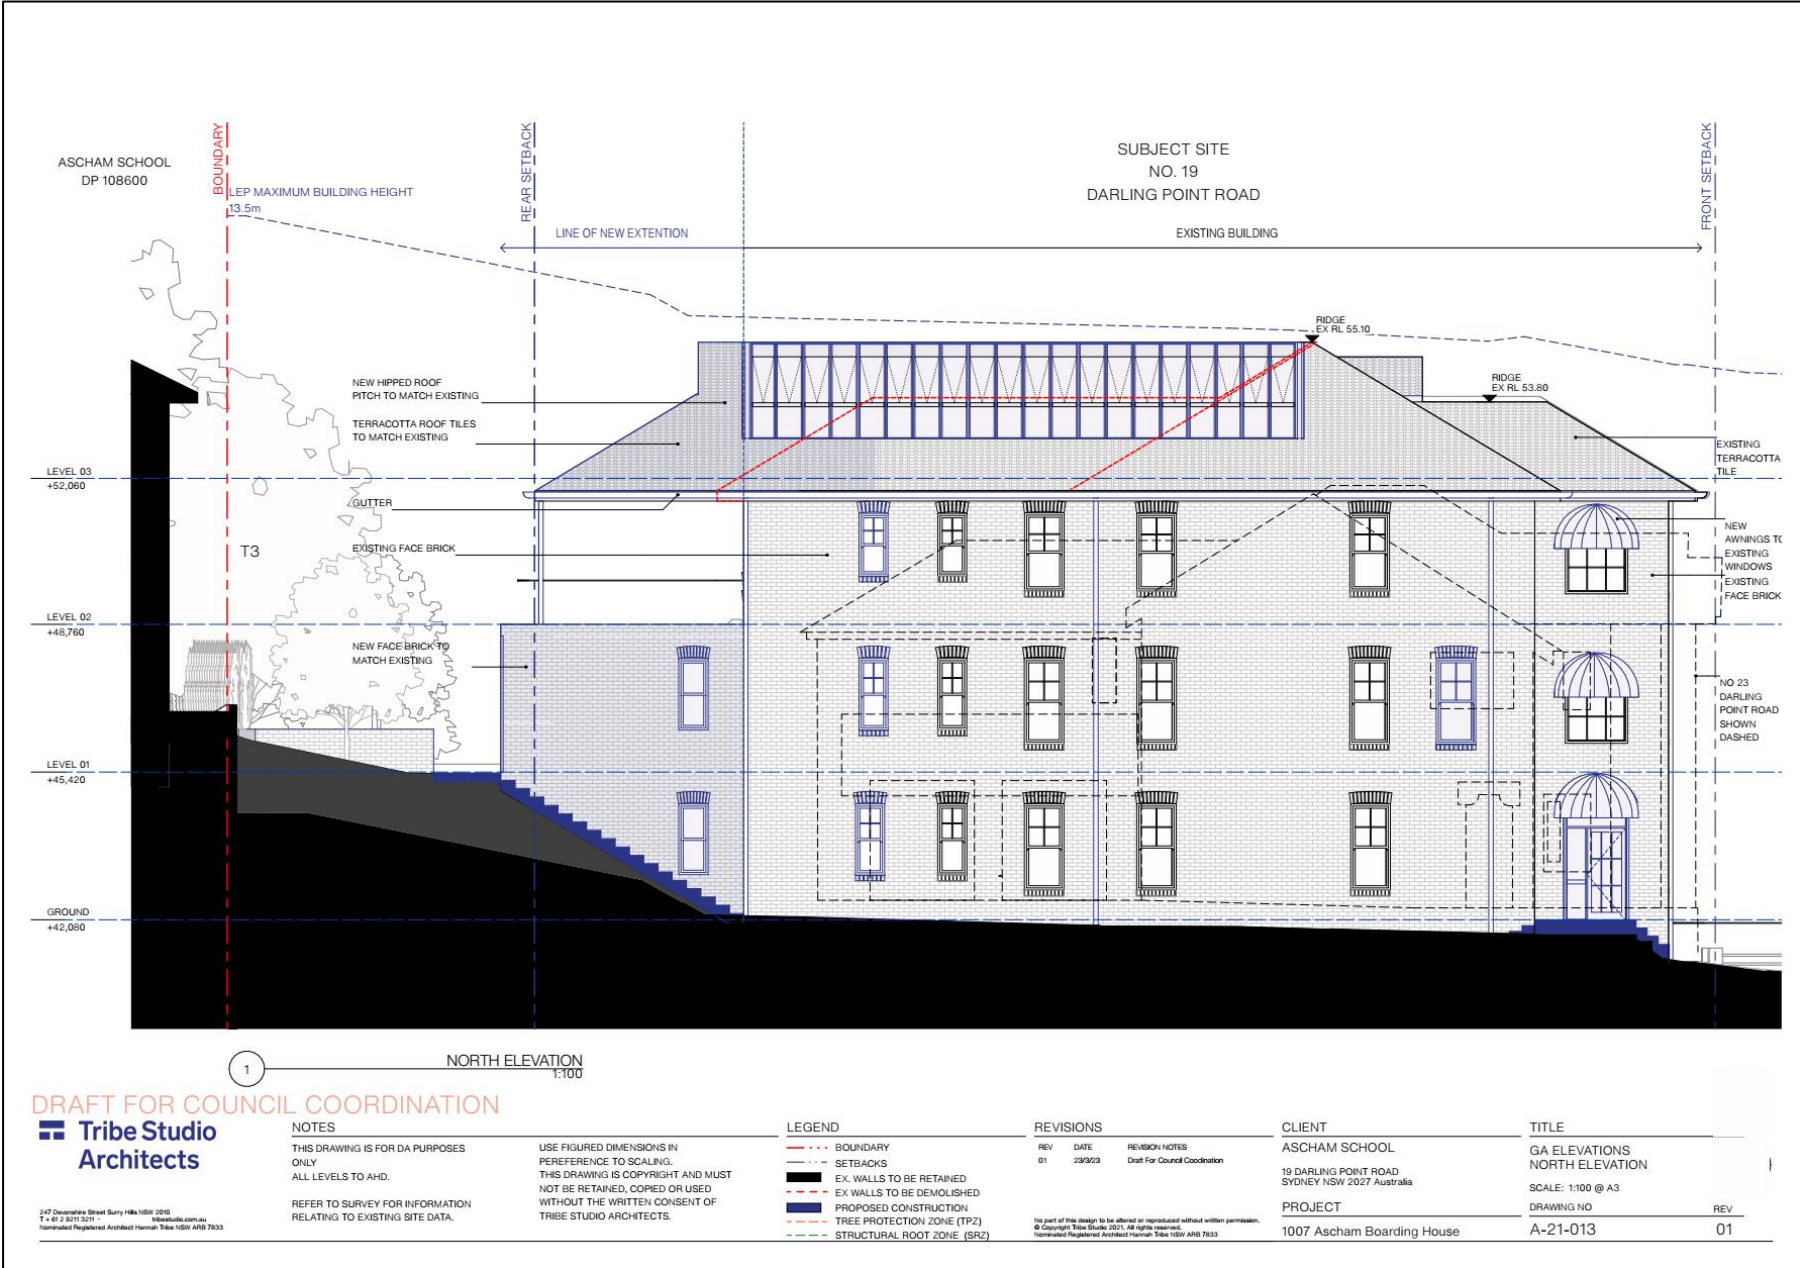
Showing the proposed north elevation for 19 Darling Point Road (plan courtesy of Tribe Studio Architects).
